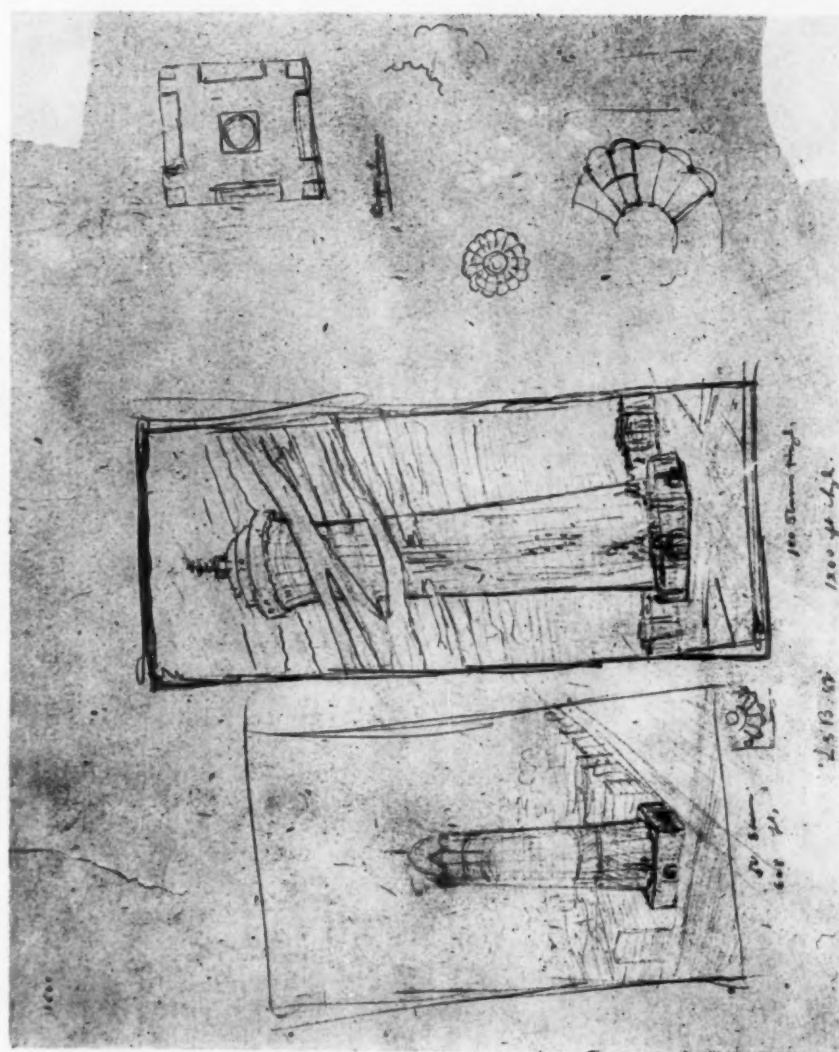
Studies for 50-Story and 100-Story Building, Dated 1882
